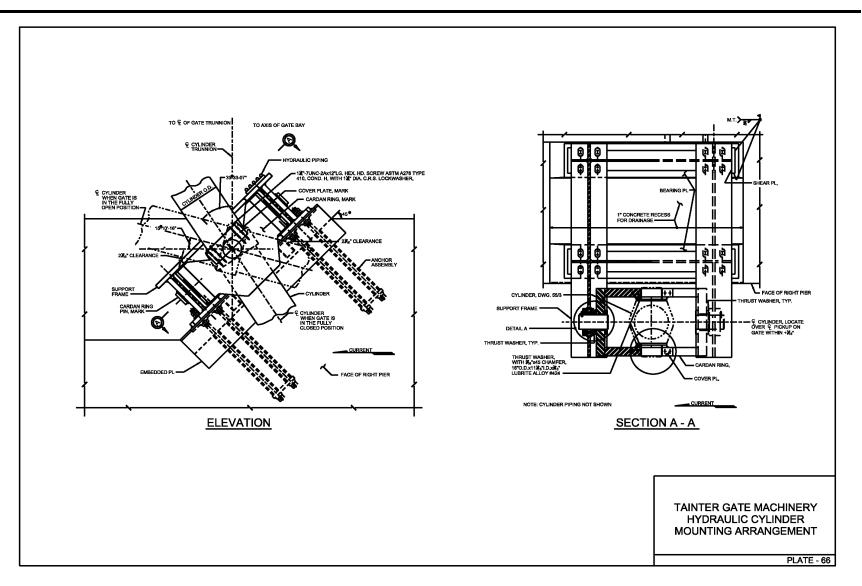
Plate 66: Tainter gate machinery, hydraulic cylinder, mounting arrangement
